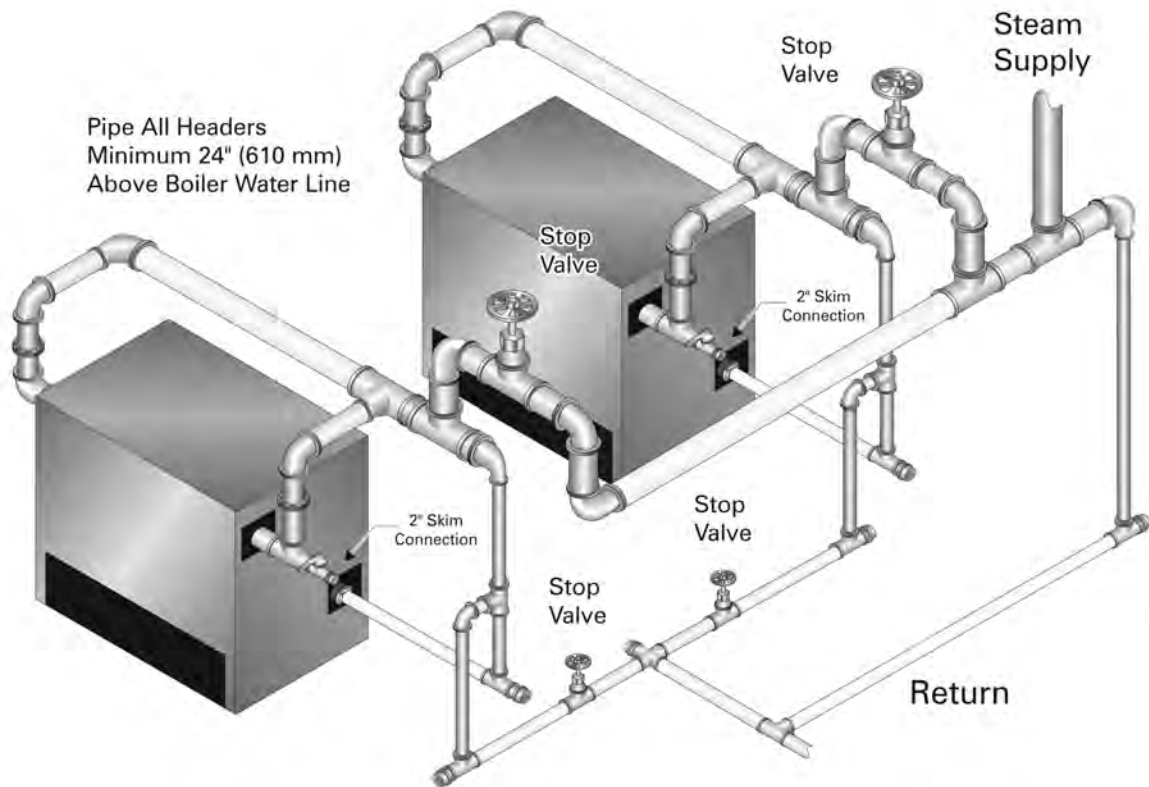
Left Hand Piping Arrangement – Typical
